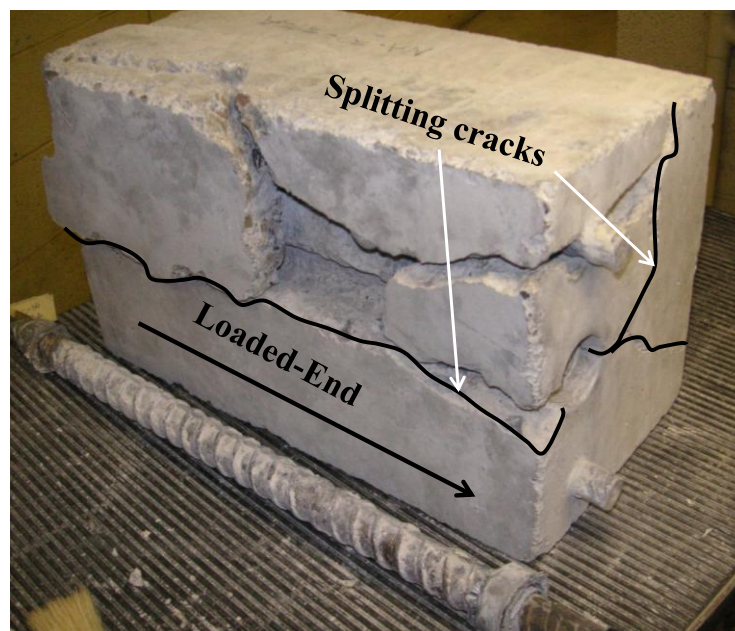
Main anchorage zone and splitting crack pattern (dissected BE-NAC-30-375A)
